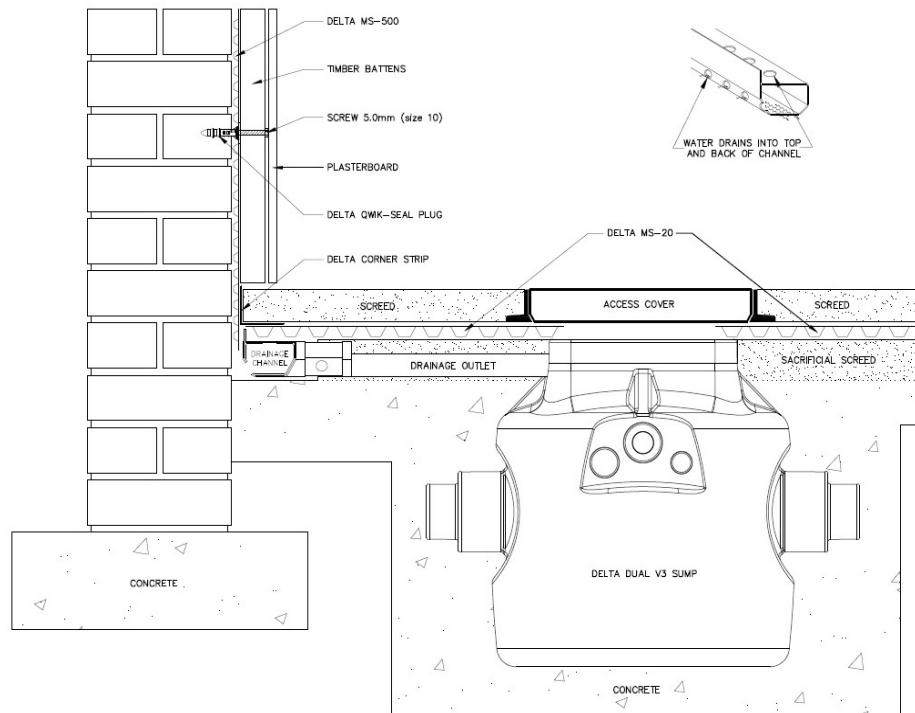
TYPICAL WATERPROOFING DETAIL
